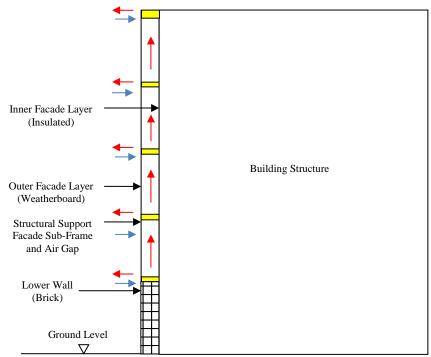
Rainscreen Facade Block Diagram (Section View)
